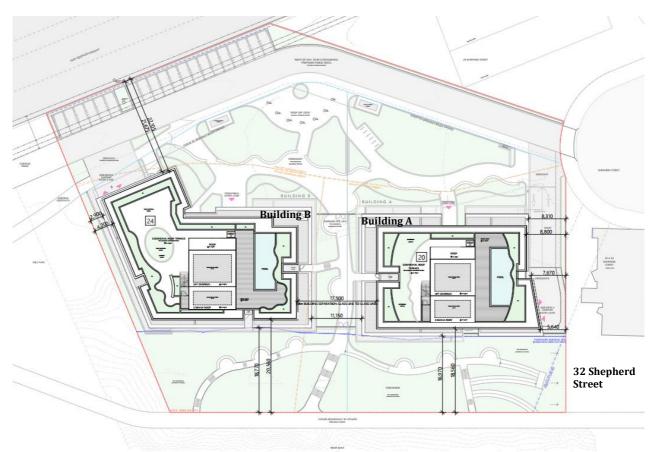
Site Plan showing location of proposed buildings and adjoining building at 32 Shepherd Street
